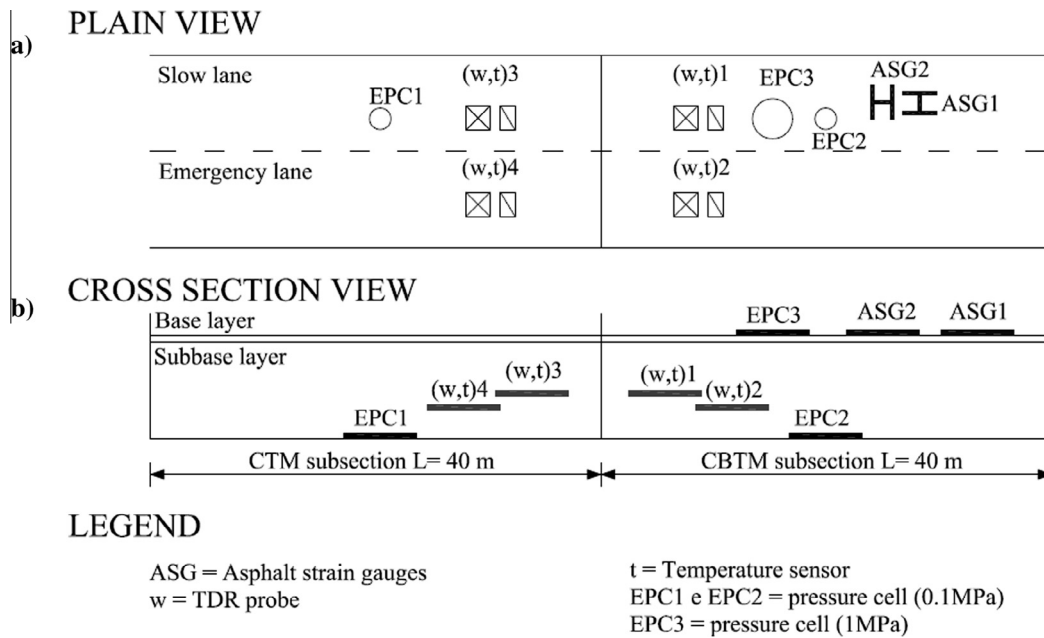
Experimental pavement section: (a) plain and (b) cross section view.
